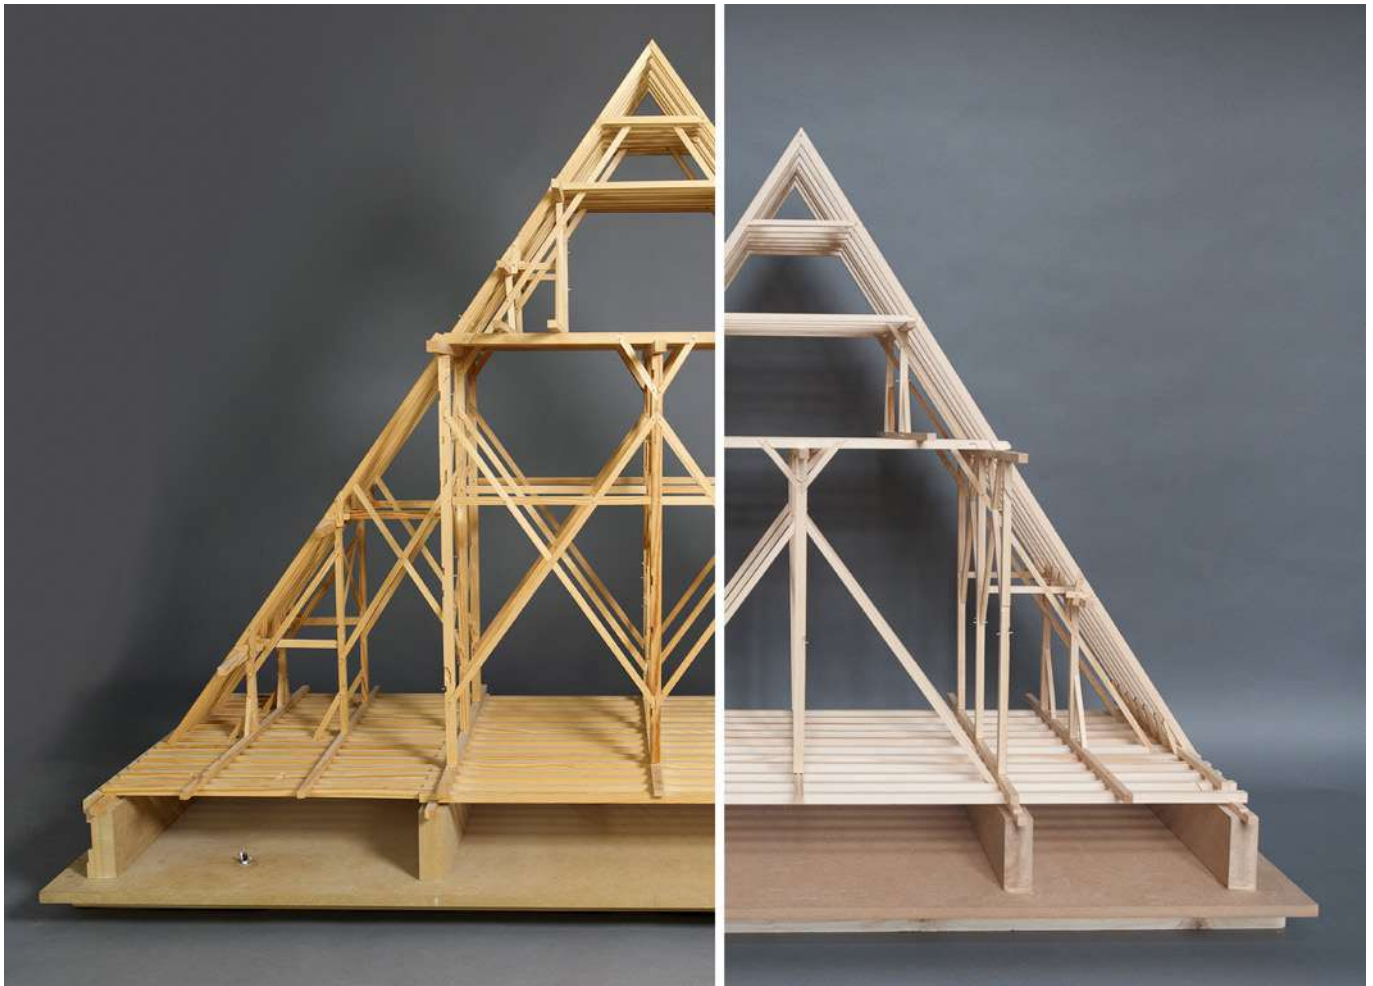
Roof constructions of the Frauenkirche (left) and St. Martin in Landshut (right). (Model: C. Knobling, Picture: I. Mühlhaus).
